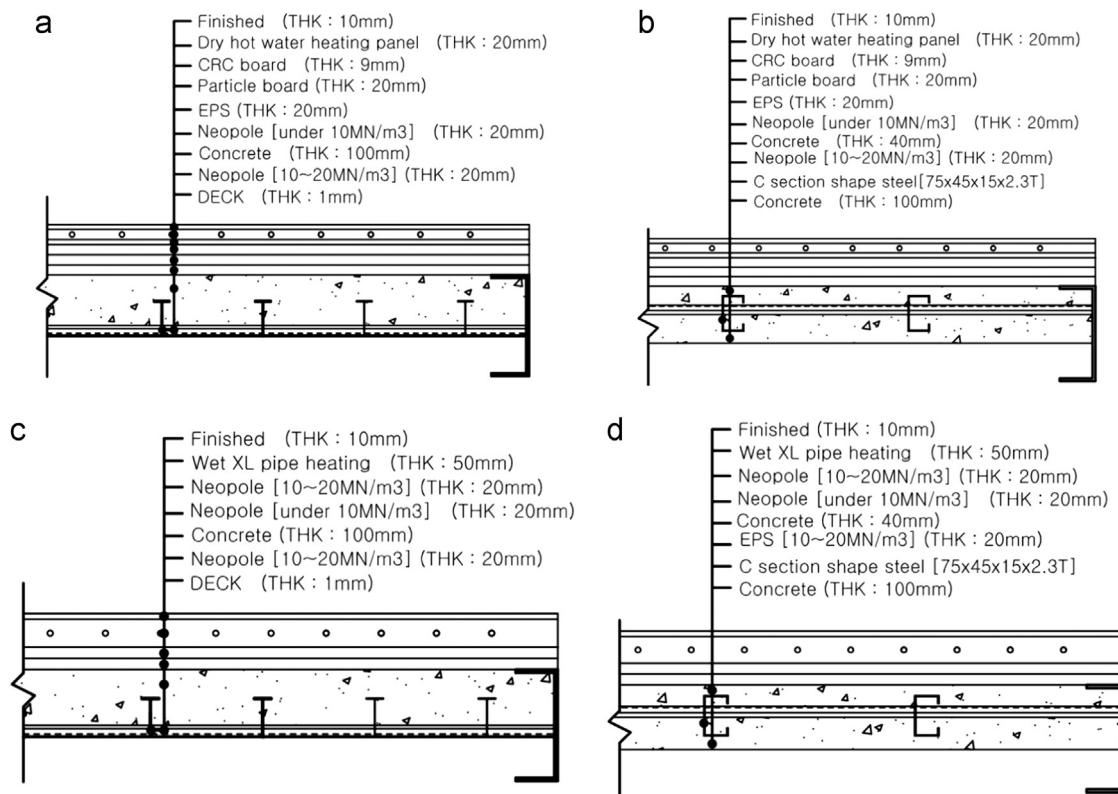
Development of floor structure. (a) Dry deck, (b) dry double slab, (c) wet deck and (d) wet double slab.
